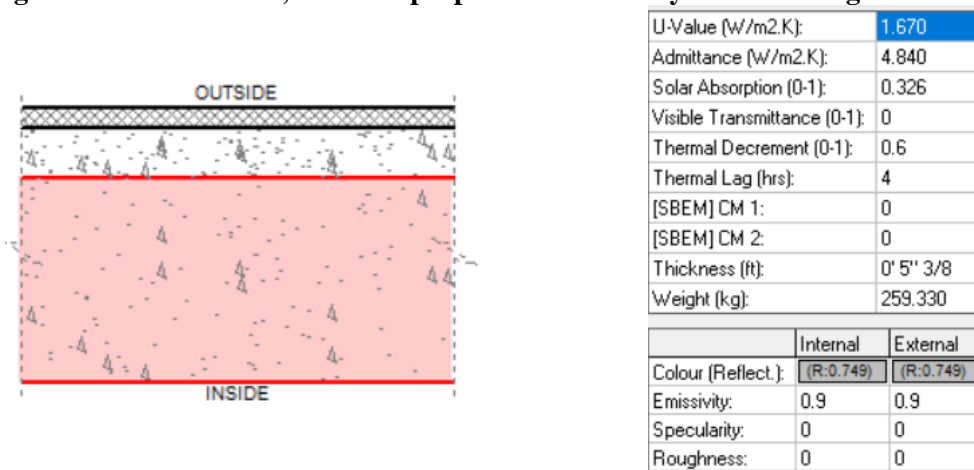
Floor Section, material properties and the layers of flooring of Ground Floor
